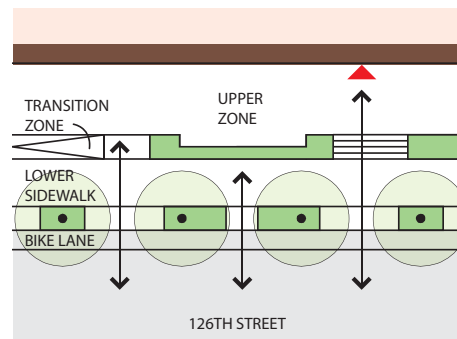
Diagram of access points between the roadway, Lower Sidewalk, Upper Zone and storefront entries.
